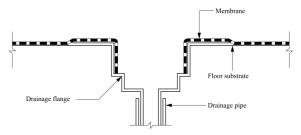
TYPICAL MEMBRANE TERMINATION AT DRAINAGE OUTLET
